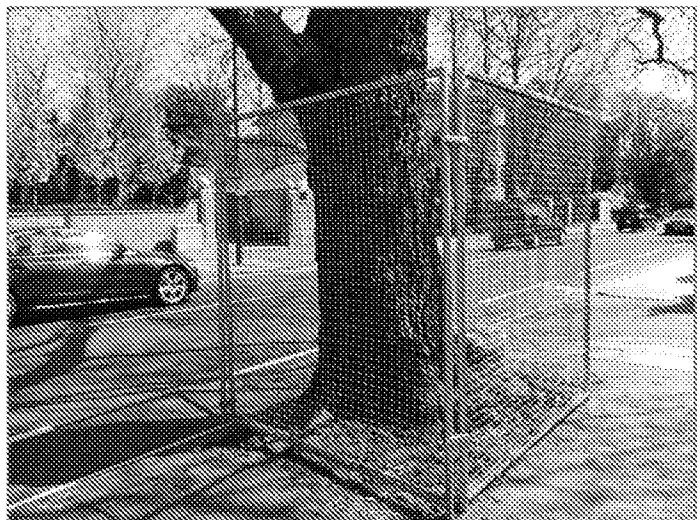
All barriers should be labelled to keep working activities outside the Construction Exclusion Zones (CEZs).
